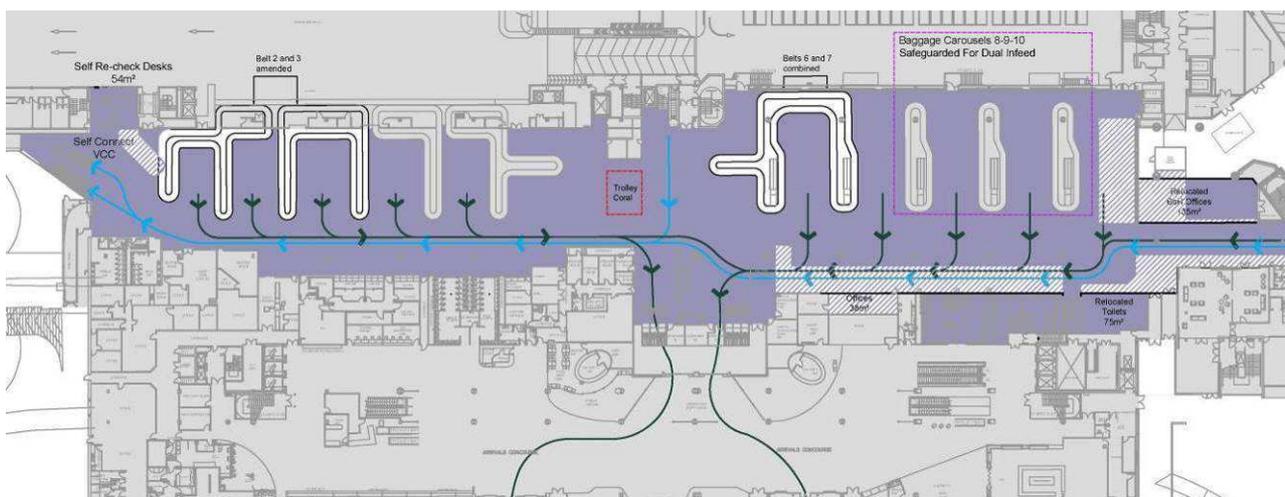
Proposed layout with enlarged belt and circulation corridors/areas
